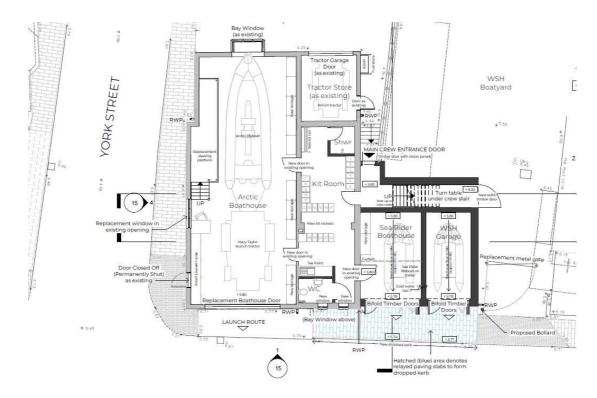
Proposed ground floor plan by Studio Four Architects
